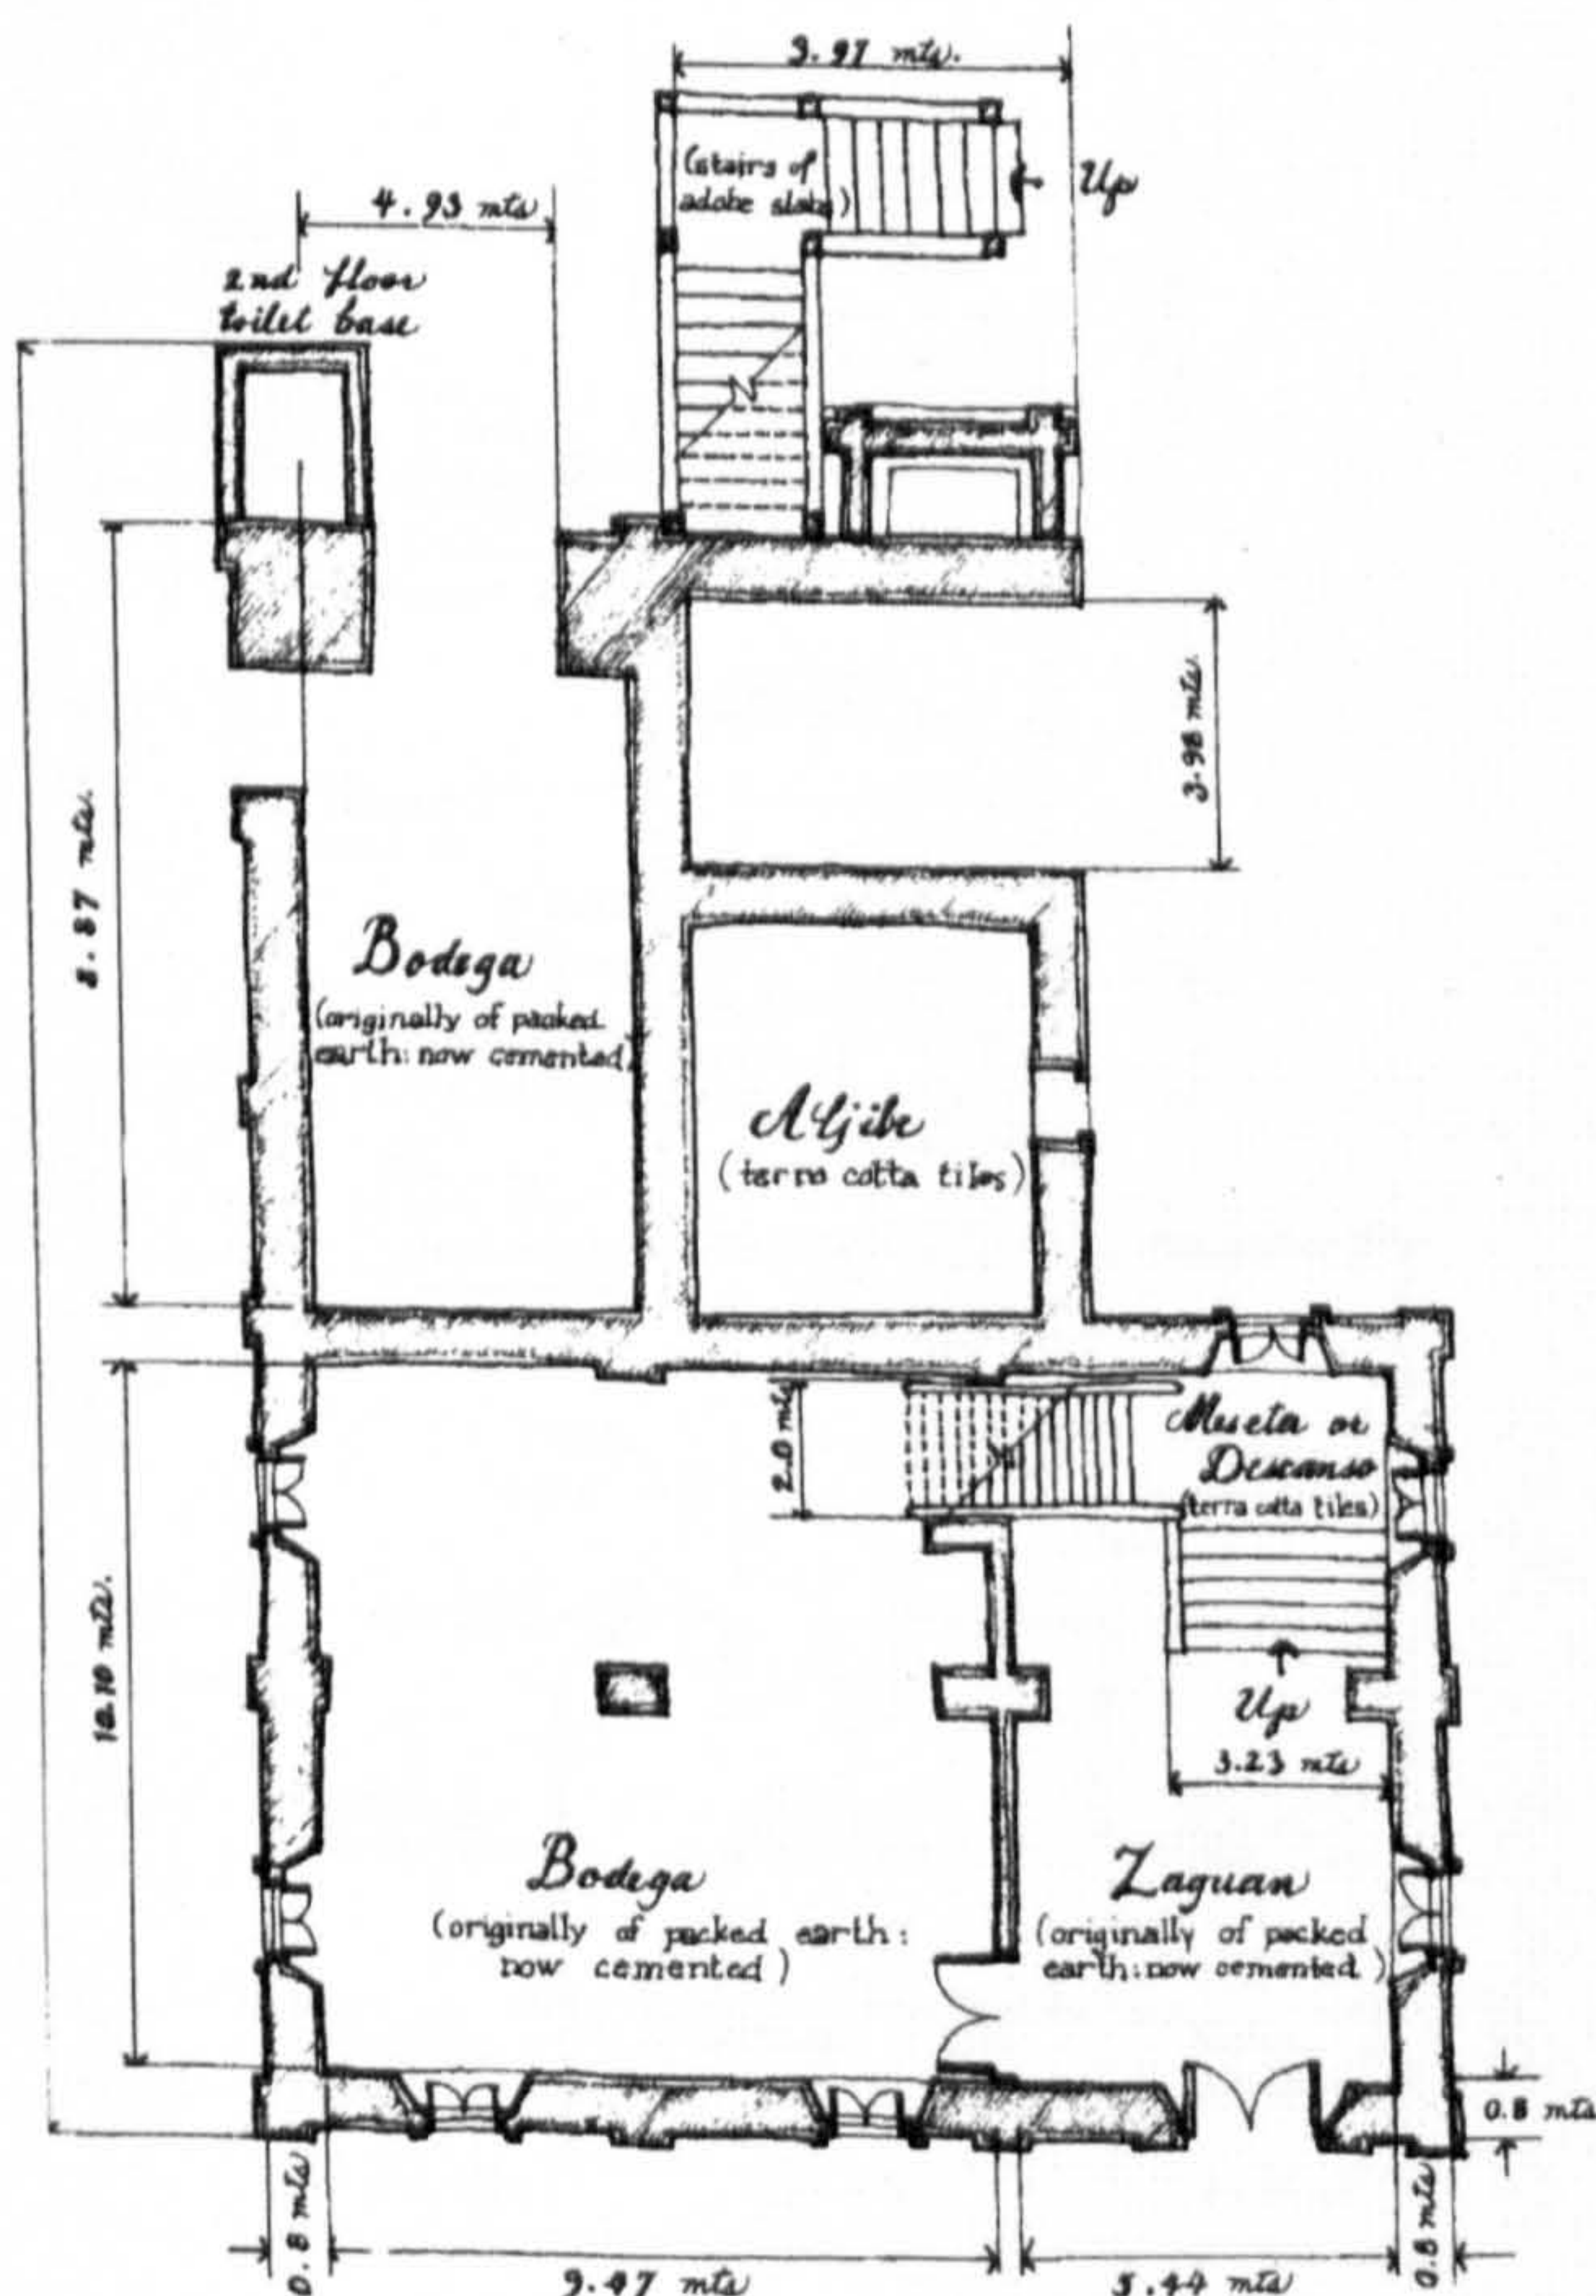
Typical ground floor plan of ancestral houses. (Sources Zialcita, 1980:121)
